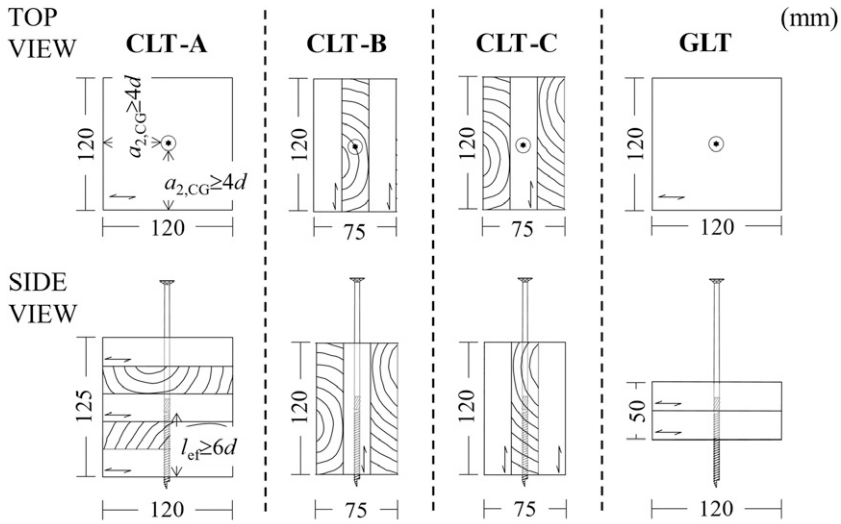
The design of specimen dimensions and self-tapping screw insertion point.
